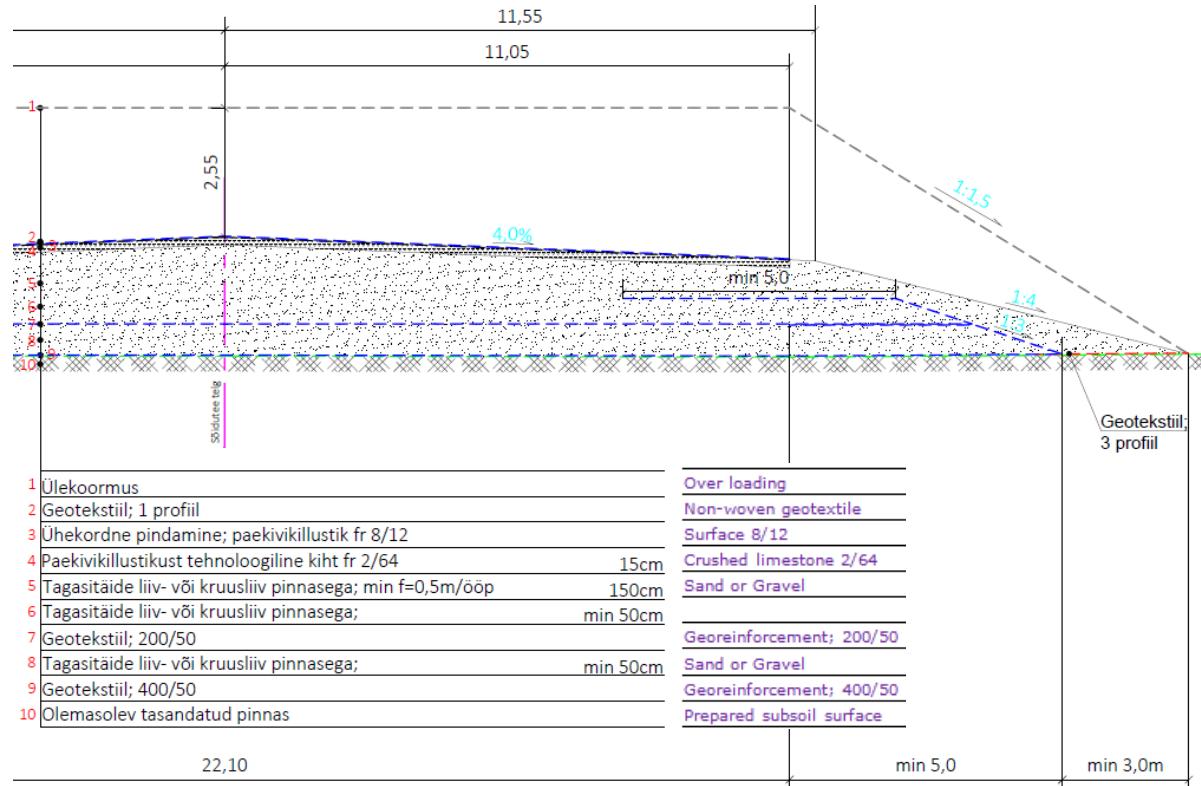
Cross-section of section 2 (two layers of georeinforcements)
